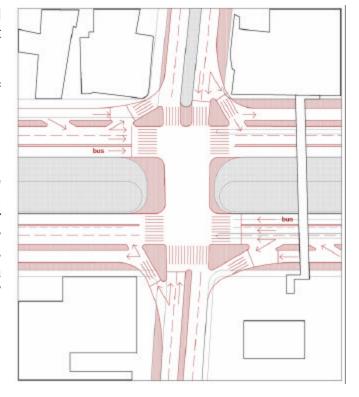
Re-design of Gadjah Mada Intersection, Preliminary Concept
